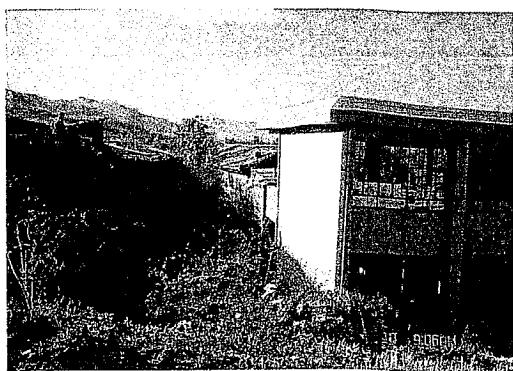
A site to be constructed, taken at east side of Xiachunren Primary School, Jinshan Town, Gucheng District, Lijiang
